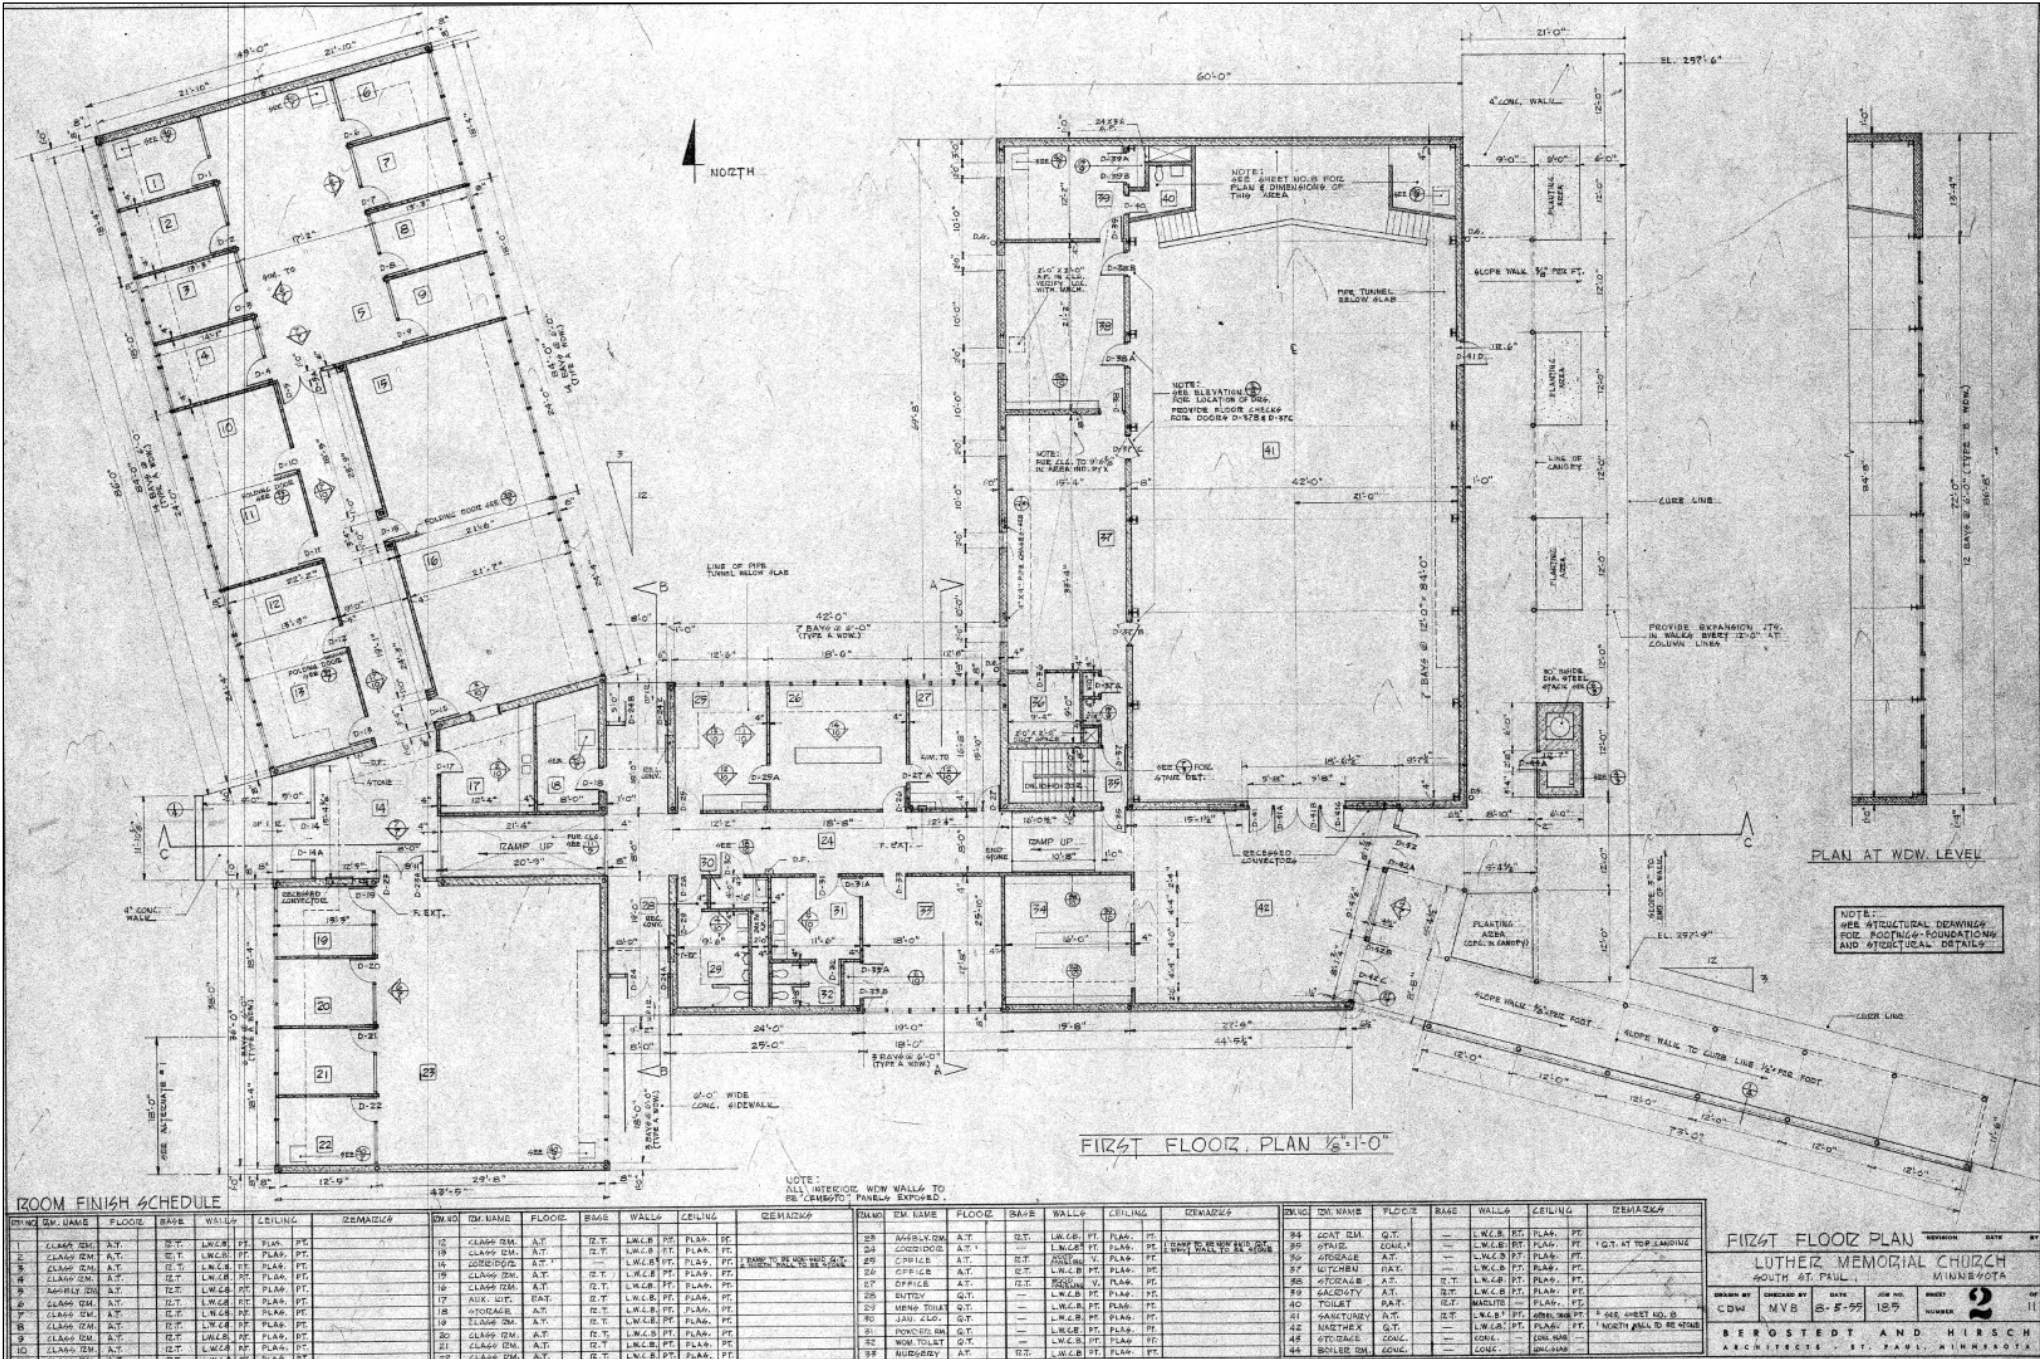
FIRST-FLOOR PLAN FOR 1956 CONSTRUCTION, 1955
